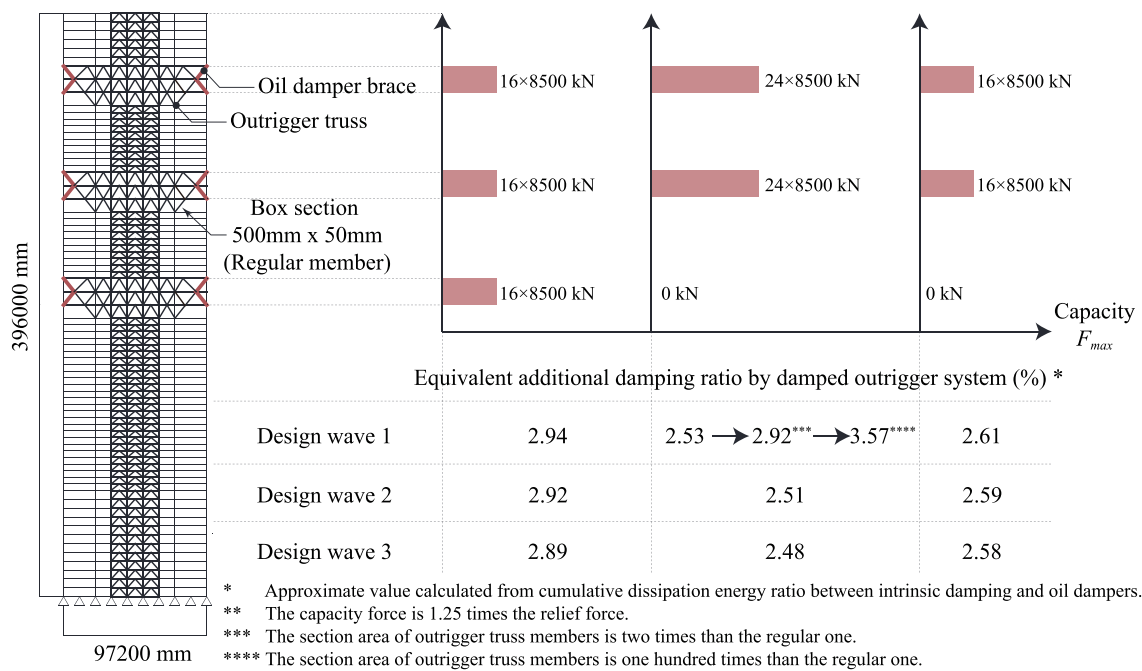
Damping performance of the damped outrigger system applied to the target building
